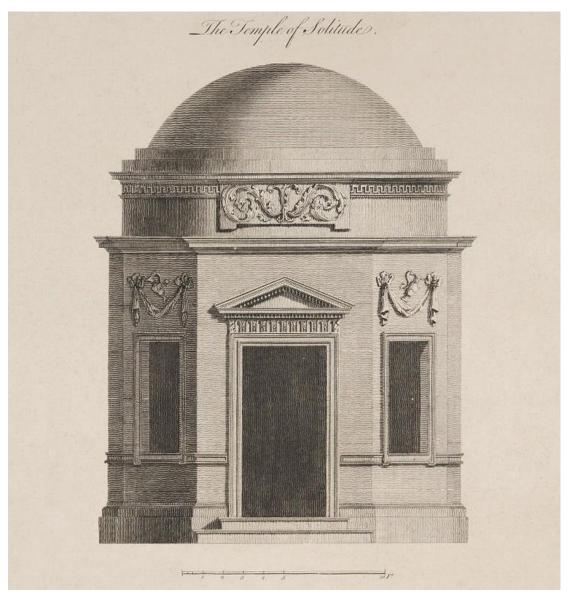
Elevation of the Temple of Solitude (Chambers 1763, Plate 14).
